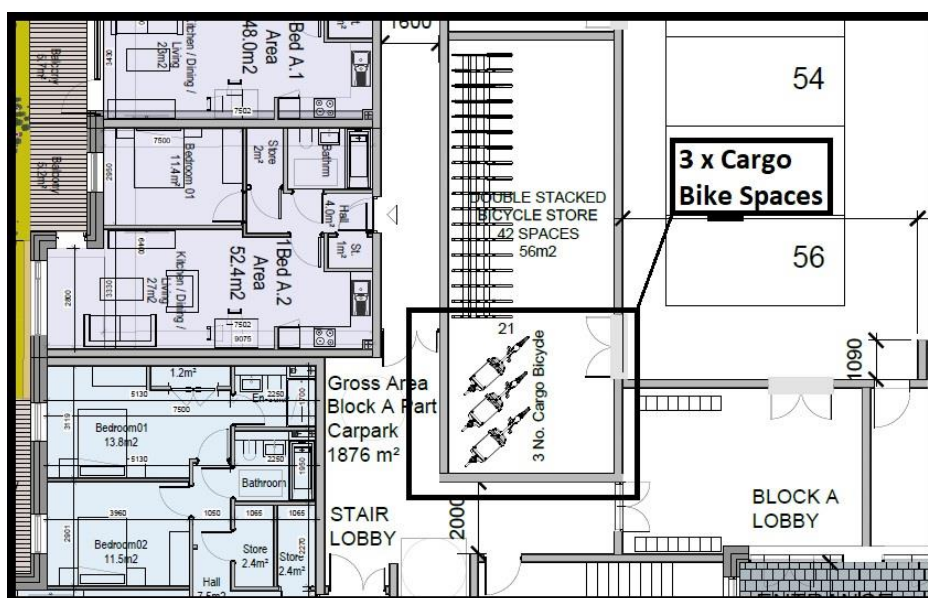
Ground Floor Plan Extract Showing Cargo Bike Spaces
